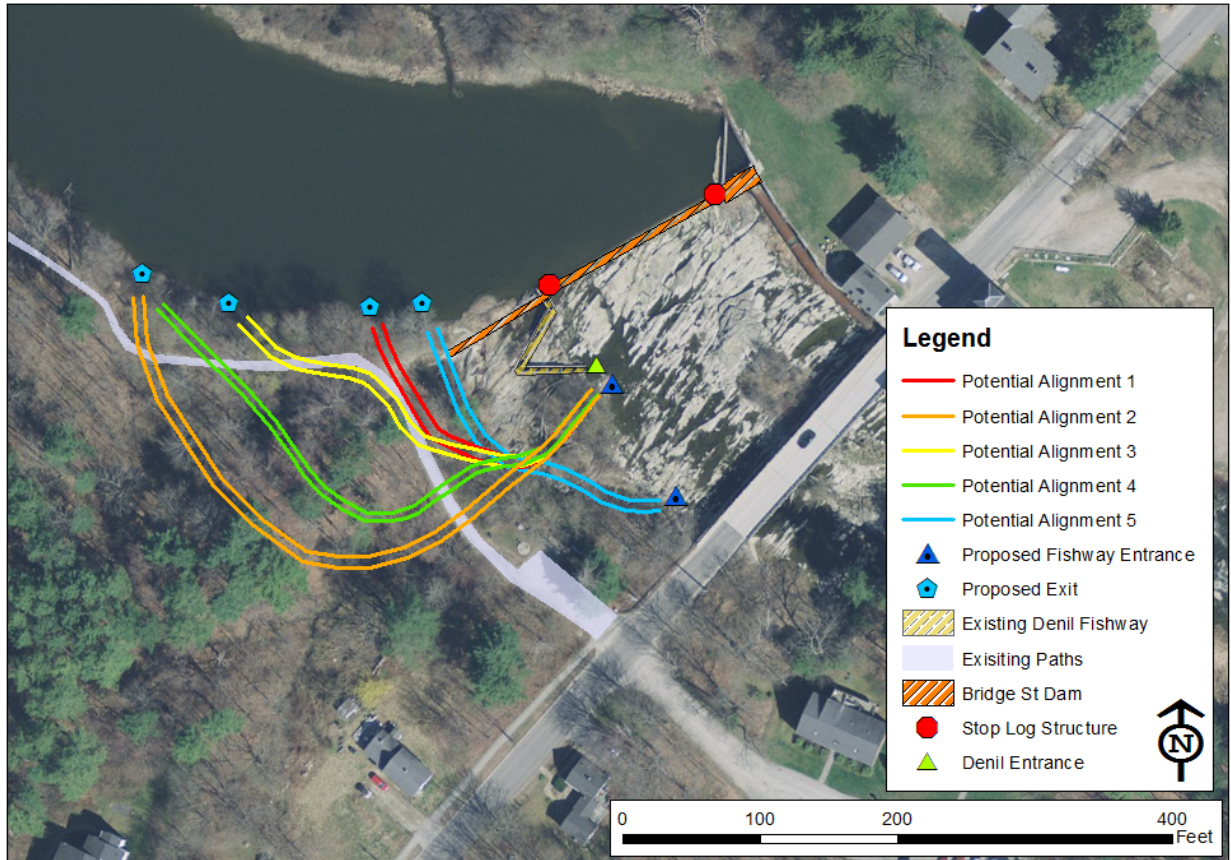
Potential alignment options for the nature-like fishway alternative at the Bridge Street dam Location. Potential nature-like fishway construction constraints are included, such as pump station and drainage outfall locations.
